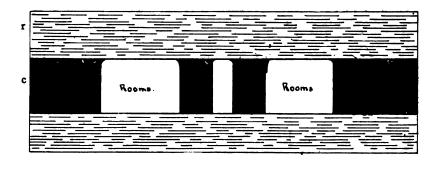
Sectional view at Honey Creek Coal Mine, tunnel No. 2, showing room and pillar method of mining. t, tunnel No. 2; r, roofing shale; c, coal bed with a maximum thickness of 35 to 36 inches, a minimum of 29½ inches and an average of 32.9, or 33 inches in round numbers.
